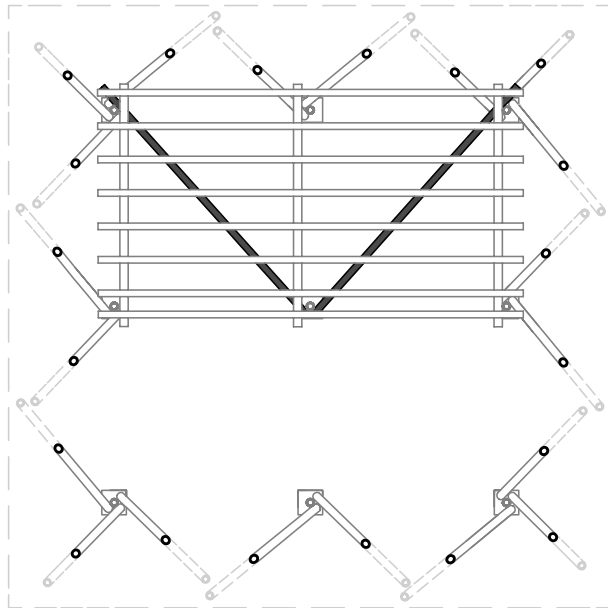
Side view of the finalised prototype. Full structure and partial wall system. July 2014. Department of Architecture. Cambridge
